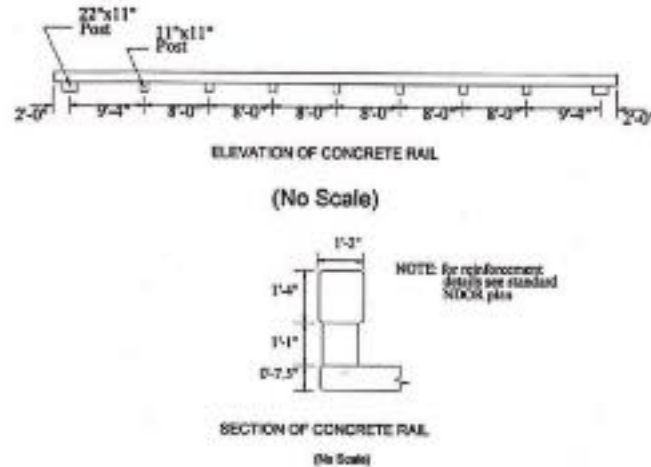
Details of standard NDOR open concrete bridge rail.
